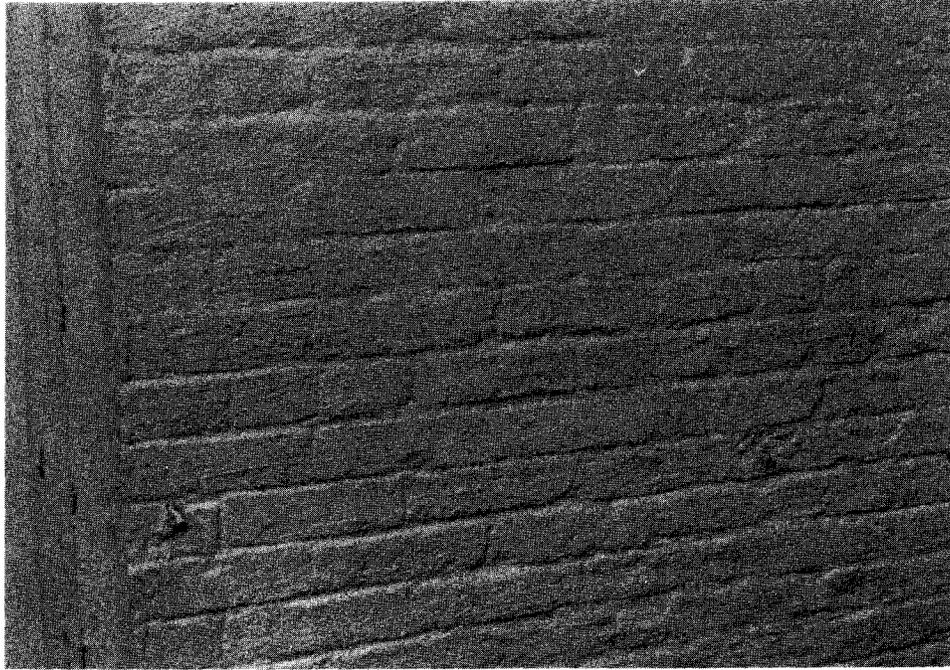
Connector at the Keeper's Dwelling, brick sizes and brush marks on east elevation.
